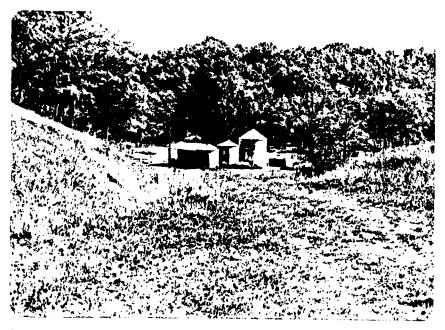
View of emergency spillway discharge channel taken at spillway crest.
